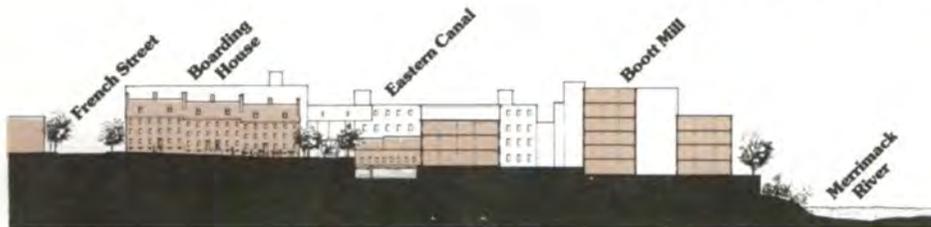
Boott Boarding House elevation and section through the Boott Mill complex
